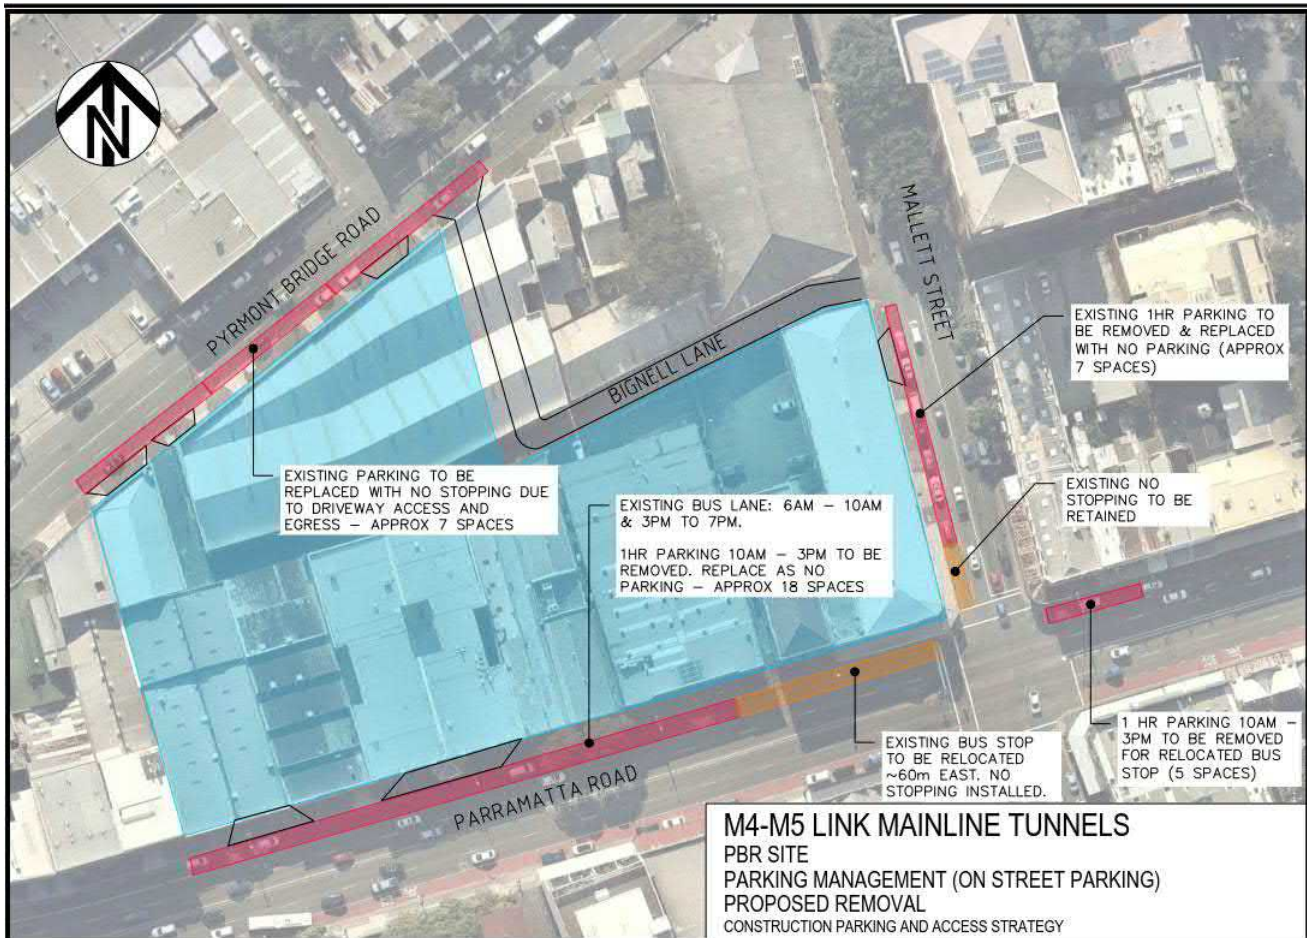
PBR On-street Parking Removal Areas - Pyrmont Bridge Road
